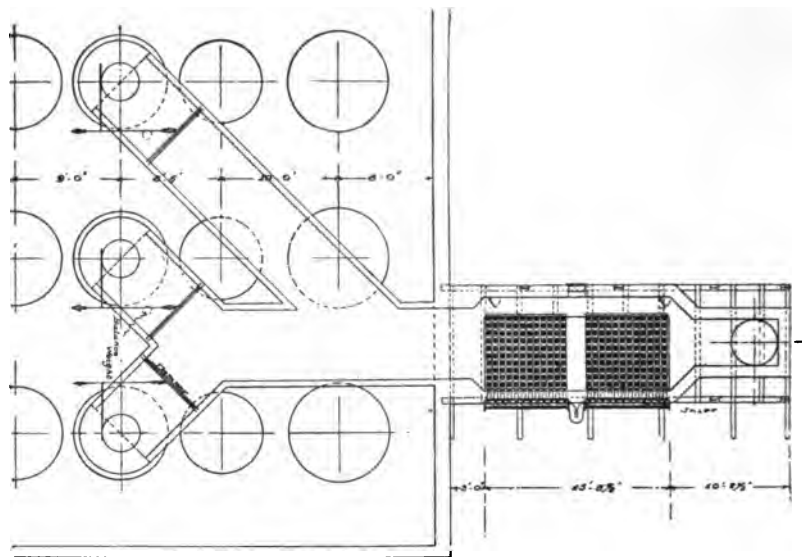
PLAN OF NEW HAVEN GAS WORKS WITH GREEN FUEL ECONOMIZER.
